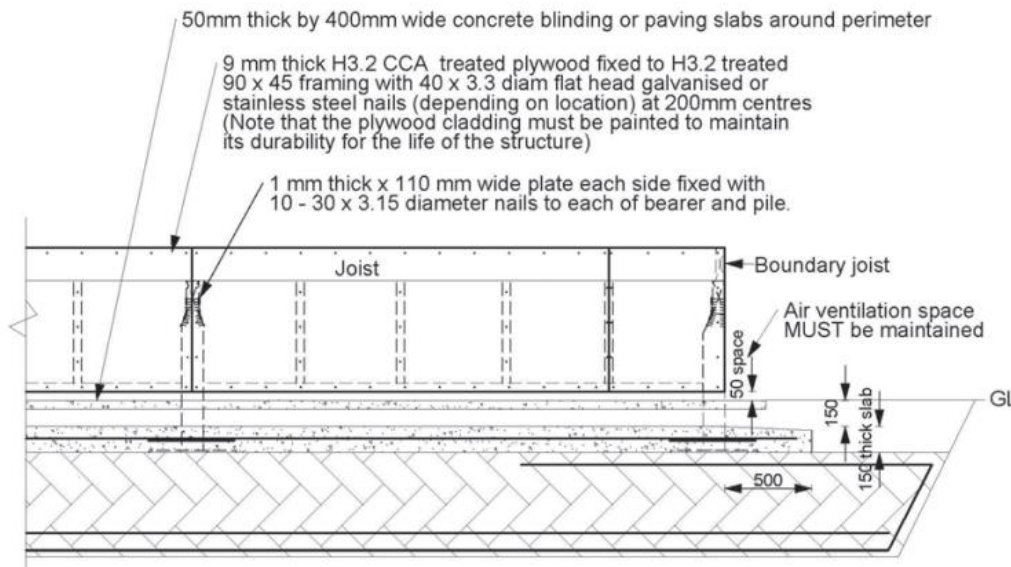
An excerpt from the MBIE Guide illustrating the plywood bracing
